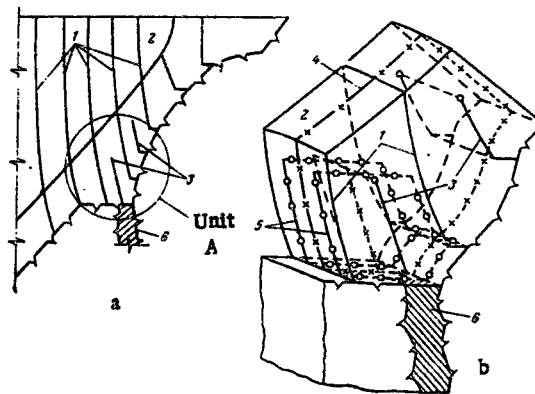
Design of the seat over the fault zone. a) Right-bank abutment of the dam; b) enlargement of unit A. 1) Intersectional joints; 2) perimetric joint; 3) additional joints oriented along the fault; 4) longitudinal joint; 5) additional joints oriented parallel to the middle surface; 6) fault.
